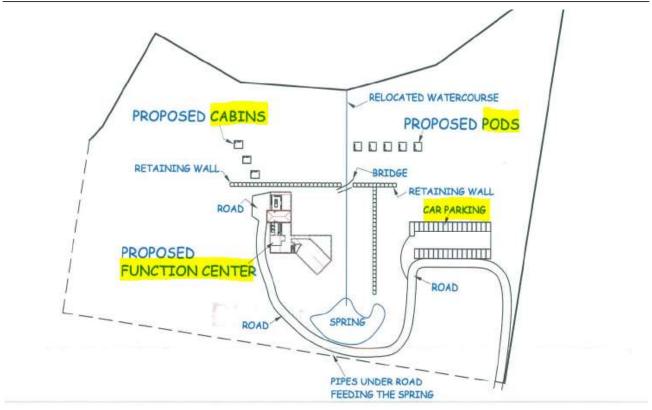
Site plan (Not to scale). Drawing source, Weeda Drafting, Project 16618
